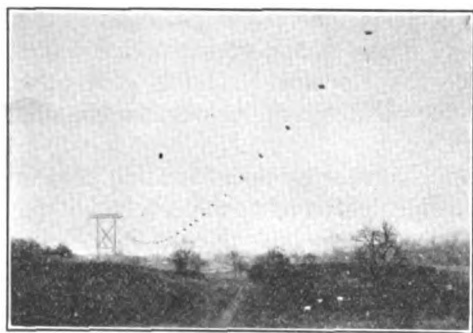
SPAN LOADED WITH SAND BAGS BETWEEN TOWER NO. 3 AND TOWER NO. 4
